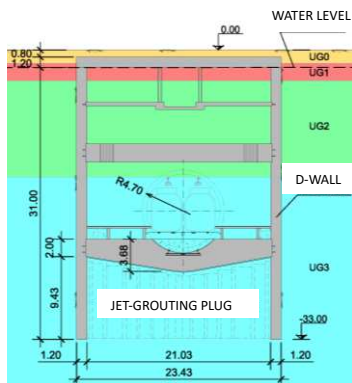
Cross-section of the D-Wall. Cross-section of the Barcelona subway structure executed with diaphragm walls and jet-grouting plug.
